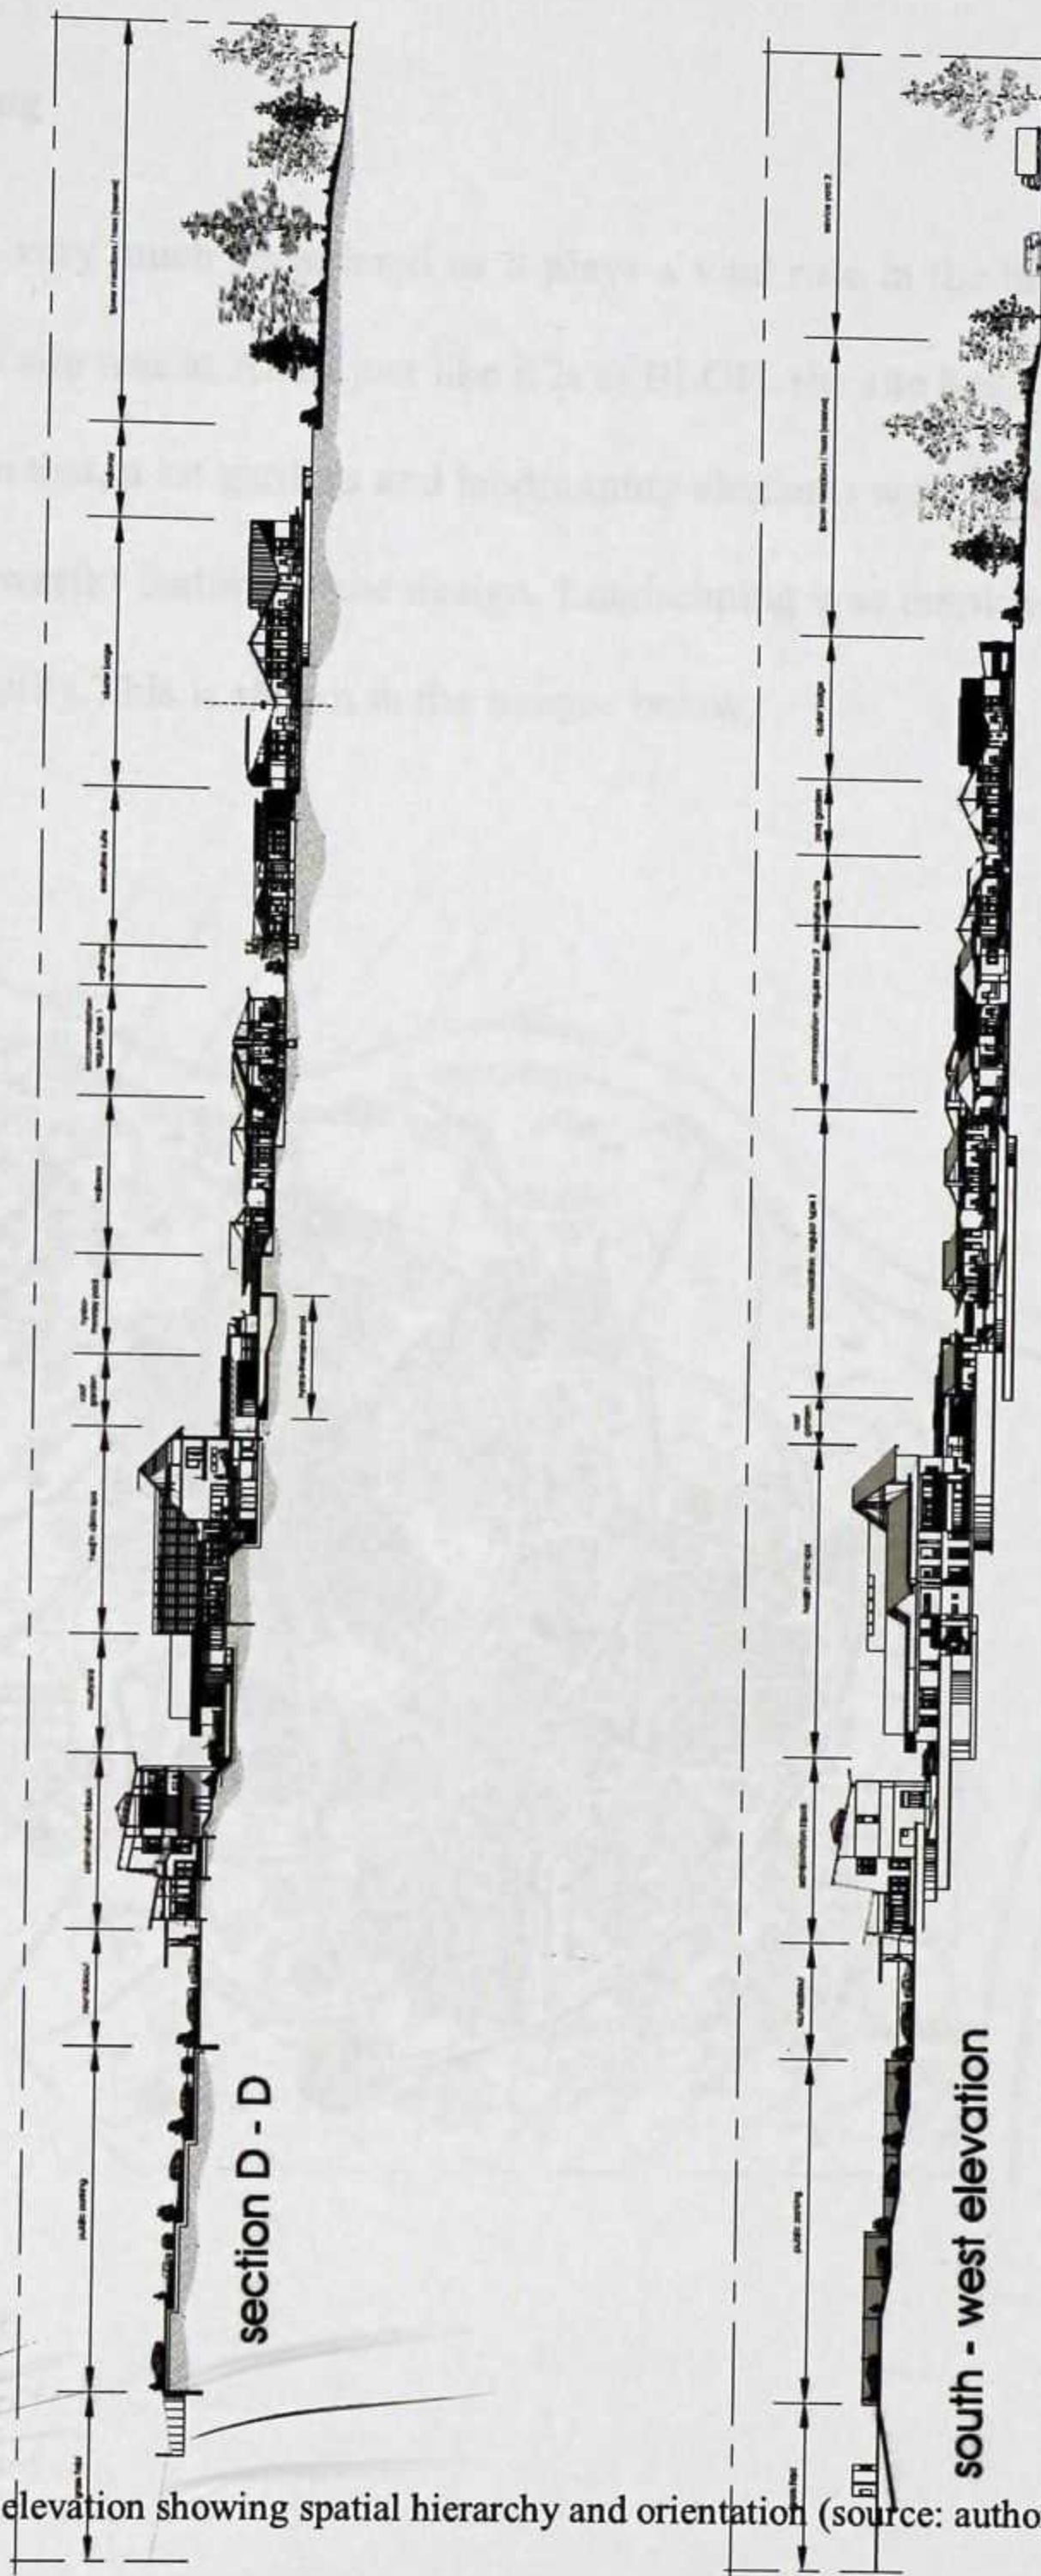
site section and elevation showing spatial hierarchy and orientation (source: author, 2011)
